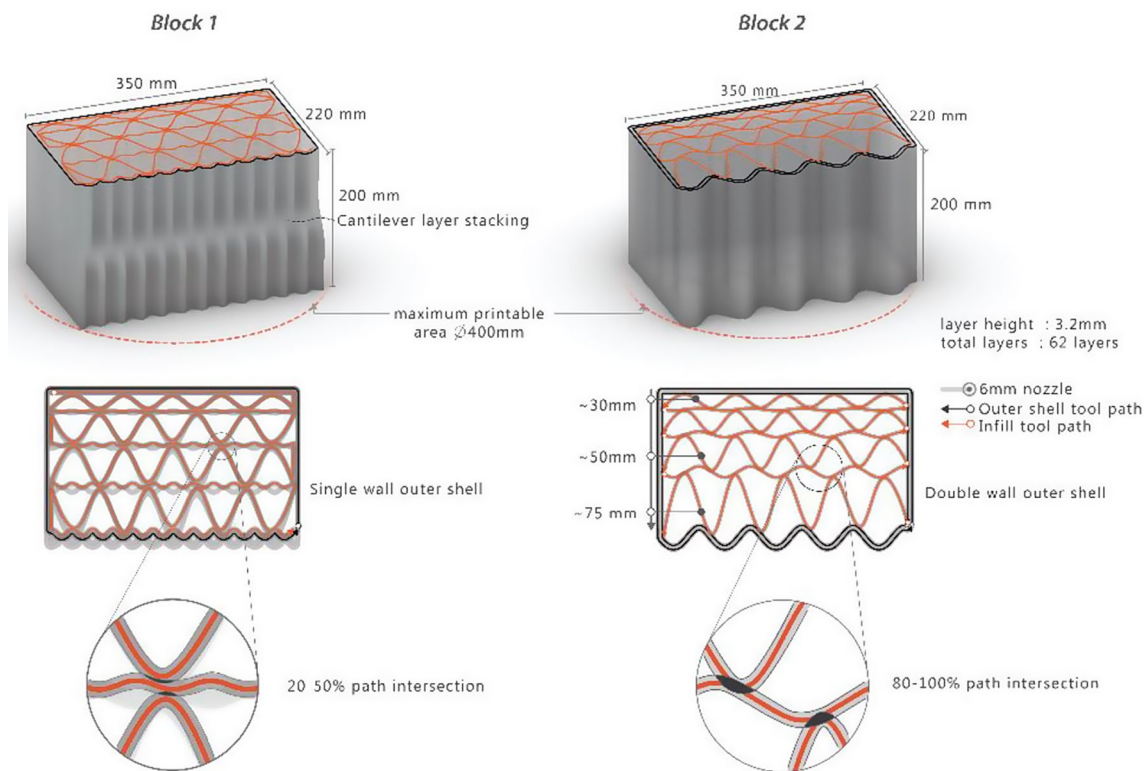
Design schematics of large-scale 3D printed test blocks as a potential wall segment
